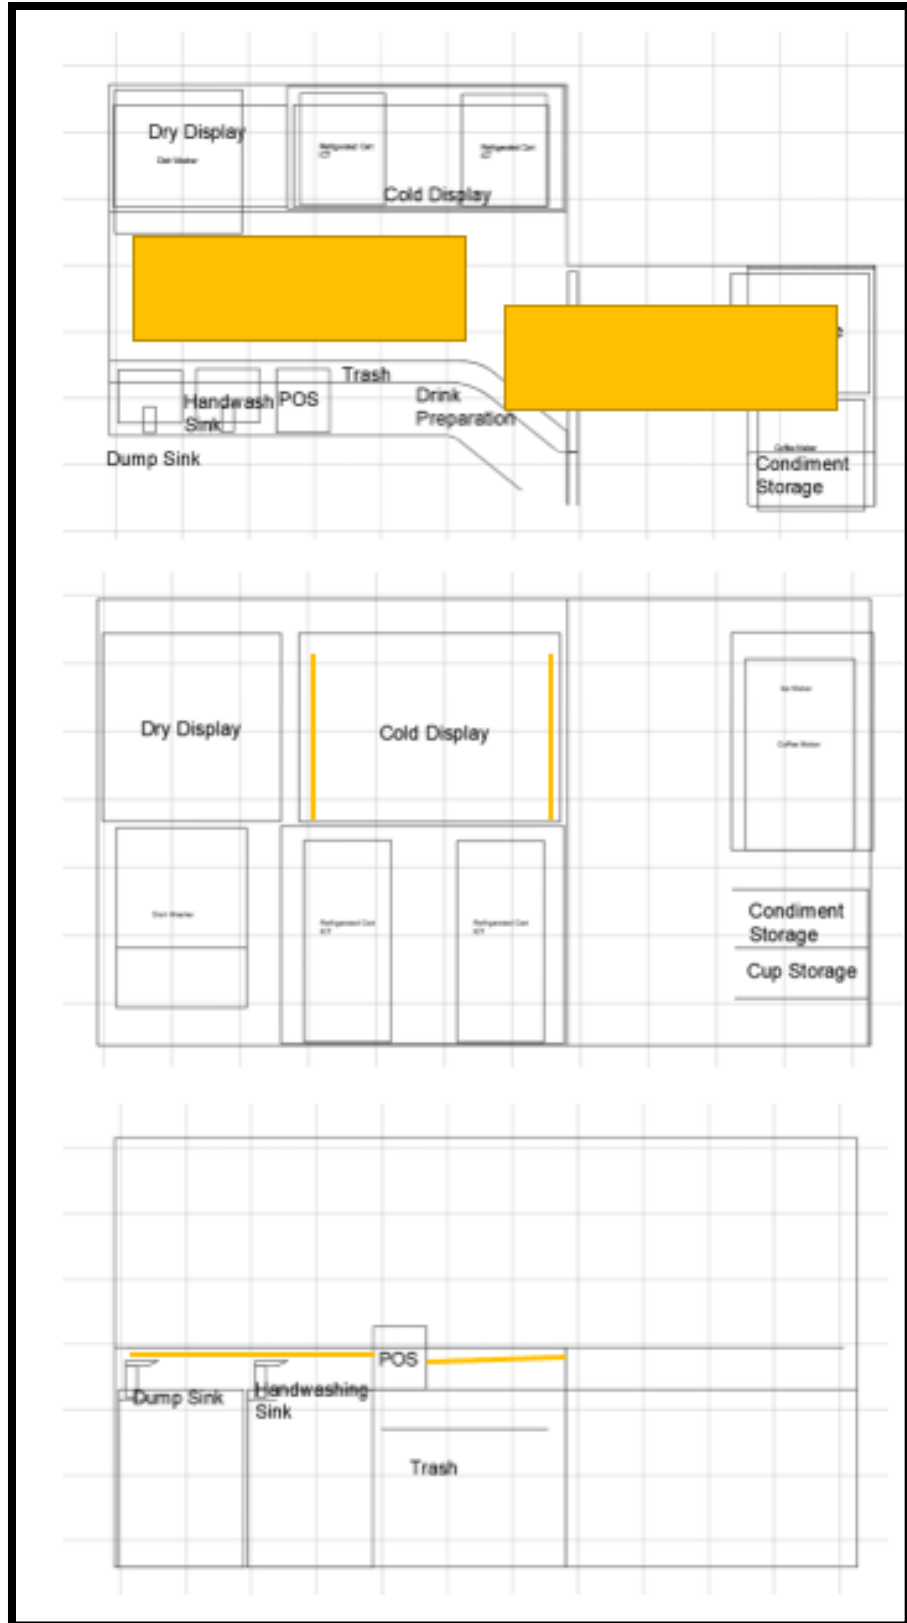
Bar Layout - Overhead, Display Case, and Strip Light General Locations
